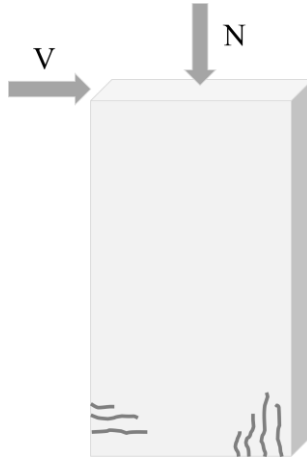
In-plane flexural failure (rocking) of a URM pier
